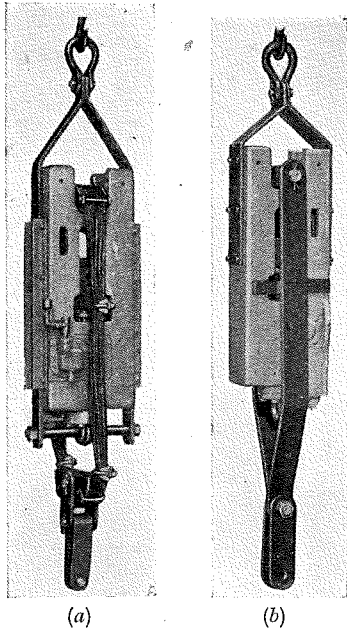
DOUBLE-ACTING PILE HAMMERS INVERTED FOR EXTRACTING SHEET STEEL PILES.
